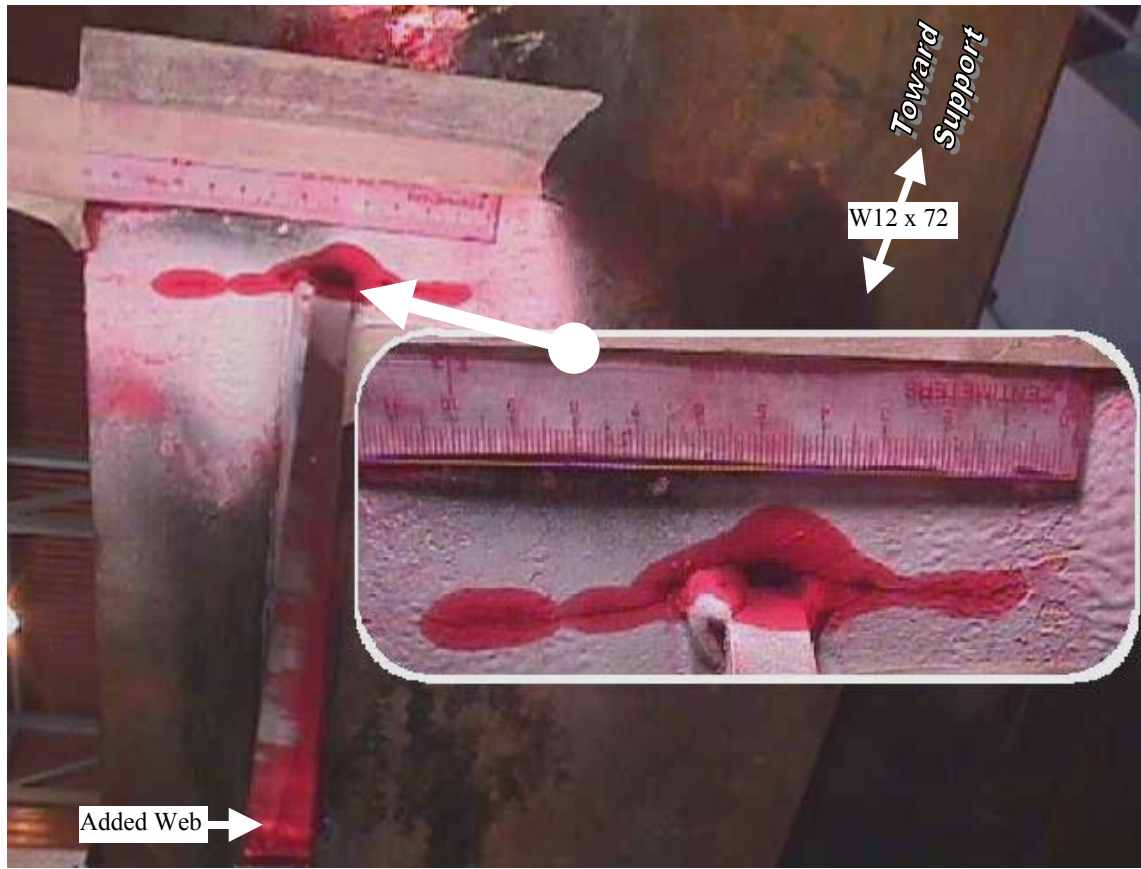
Typical crack at fillet weld termination of added web.
